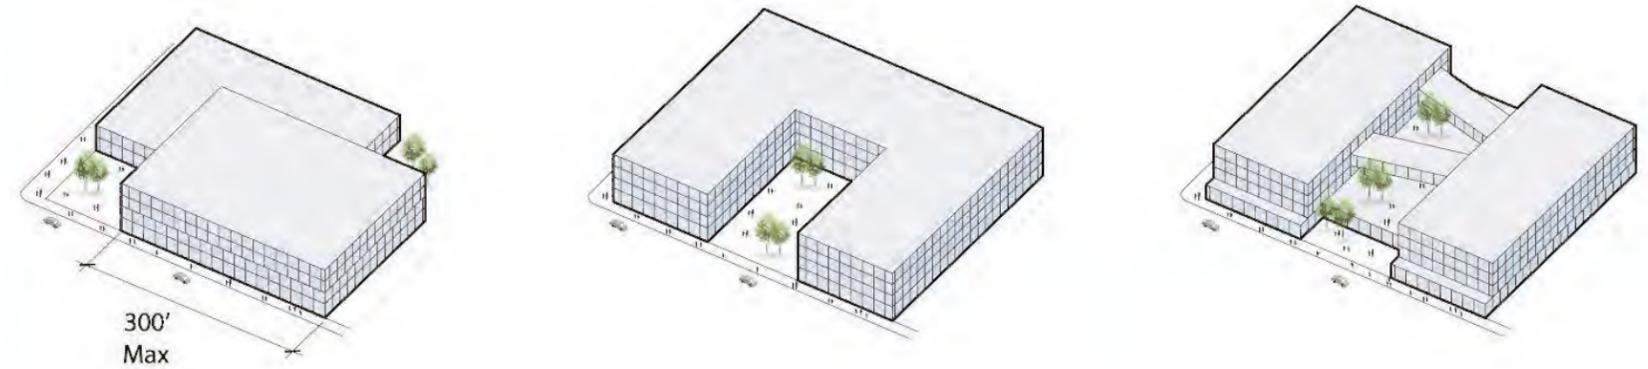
Examples of office/R&D buildings where street frontage lengths are limited to 300 feet
